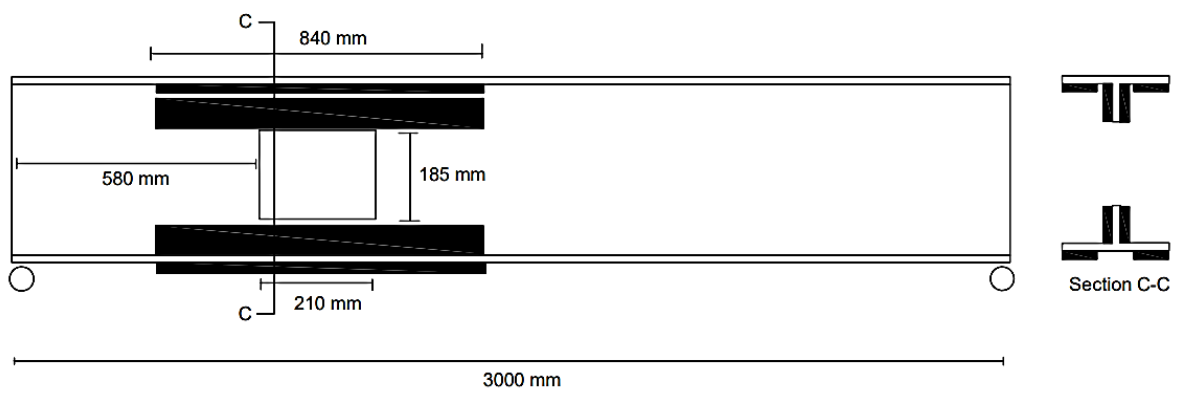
Specimen B2-R0 strengthening arrangement .
